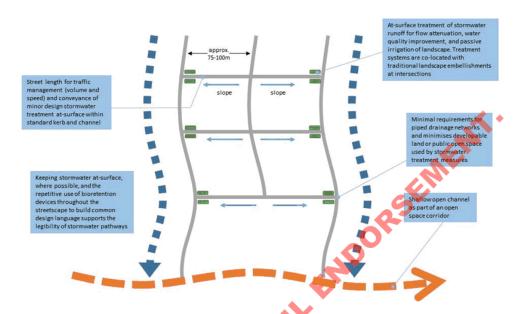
Model Street Layout for Biopods on Flat Sites (source: Concept Design Guidelines for Water Sensitive Urban Design (Water by Design, 2009))
